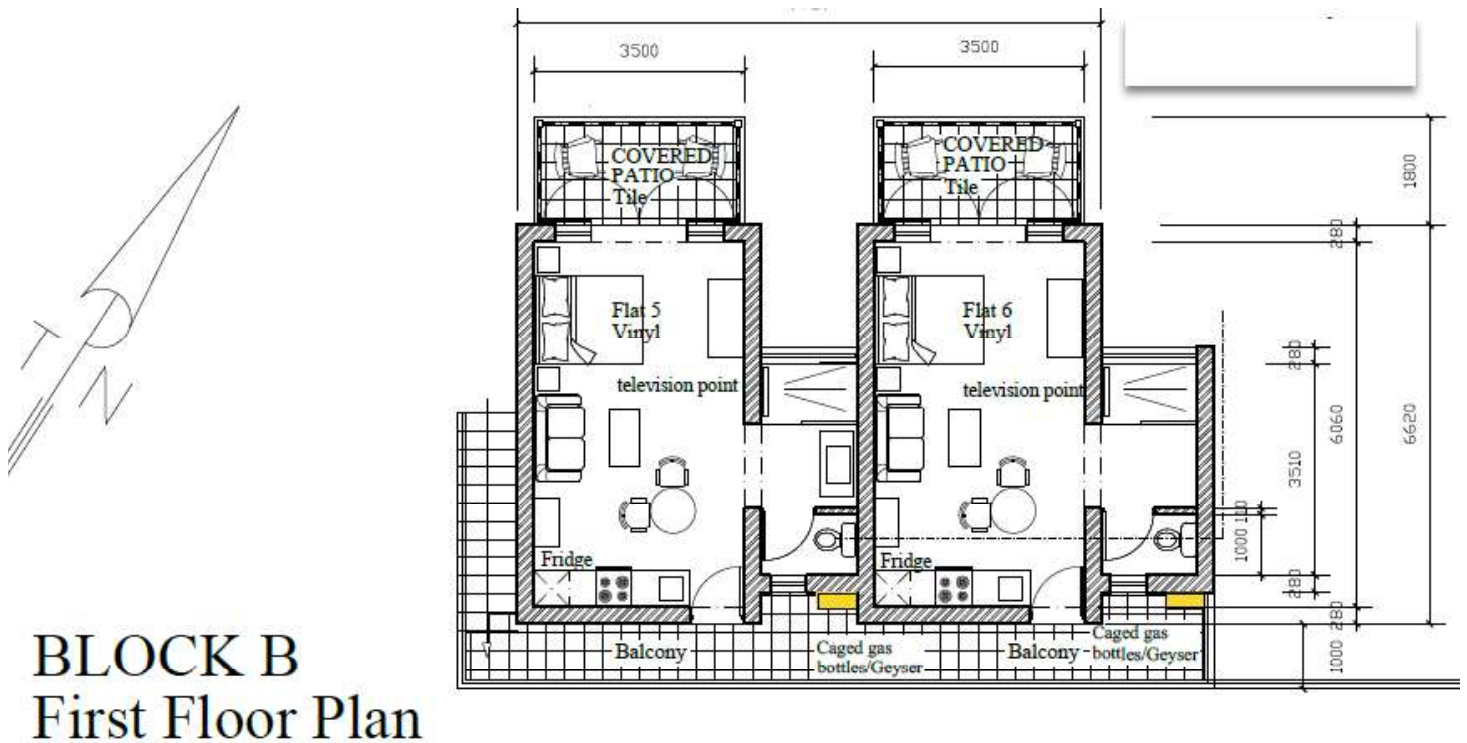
PROPOSED FIRST FLOOR (BLOCK B)
